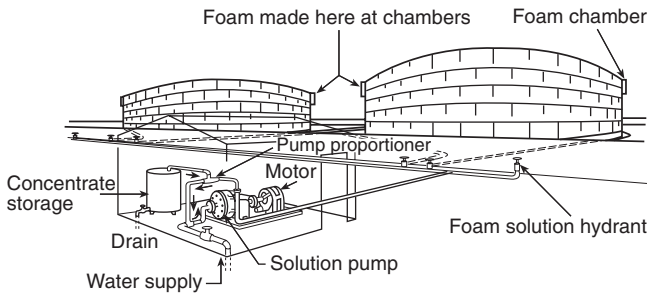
Schematic arrangement of air foam protection for storage tanks.
